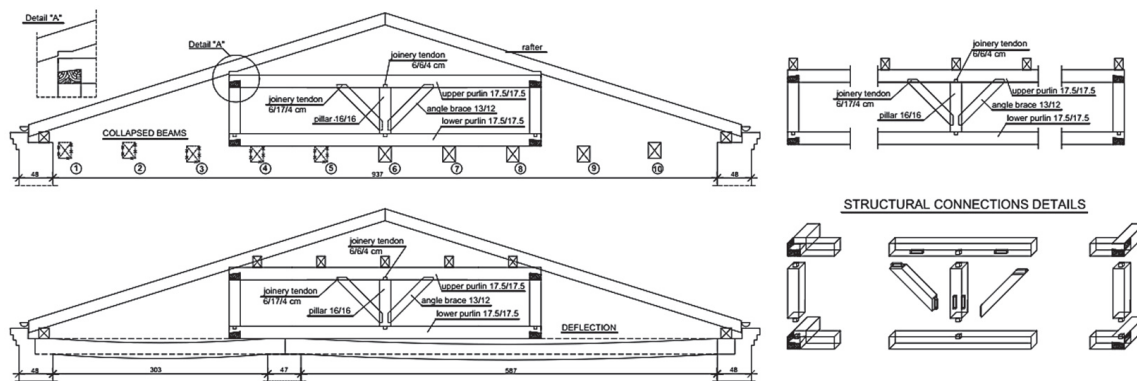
View of the roof truss structure supported by a partially destroyed ceiling.
